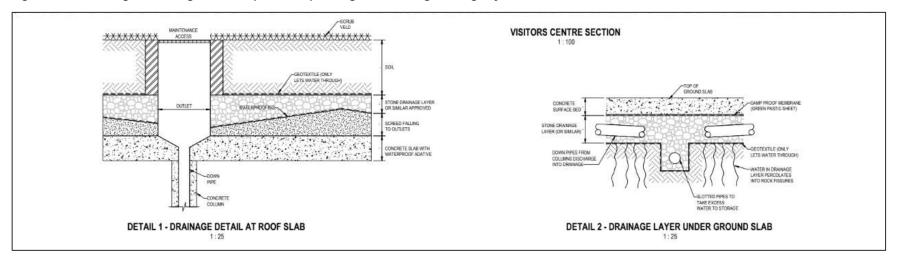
Drainage detail at the roof slab on left, and underneath the ground slab on the right
